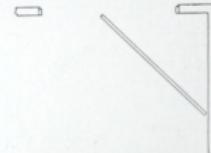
Floor plan showing position of door half closed, equipped with "SlydaSyde" EE hardware.
